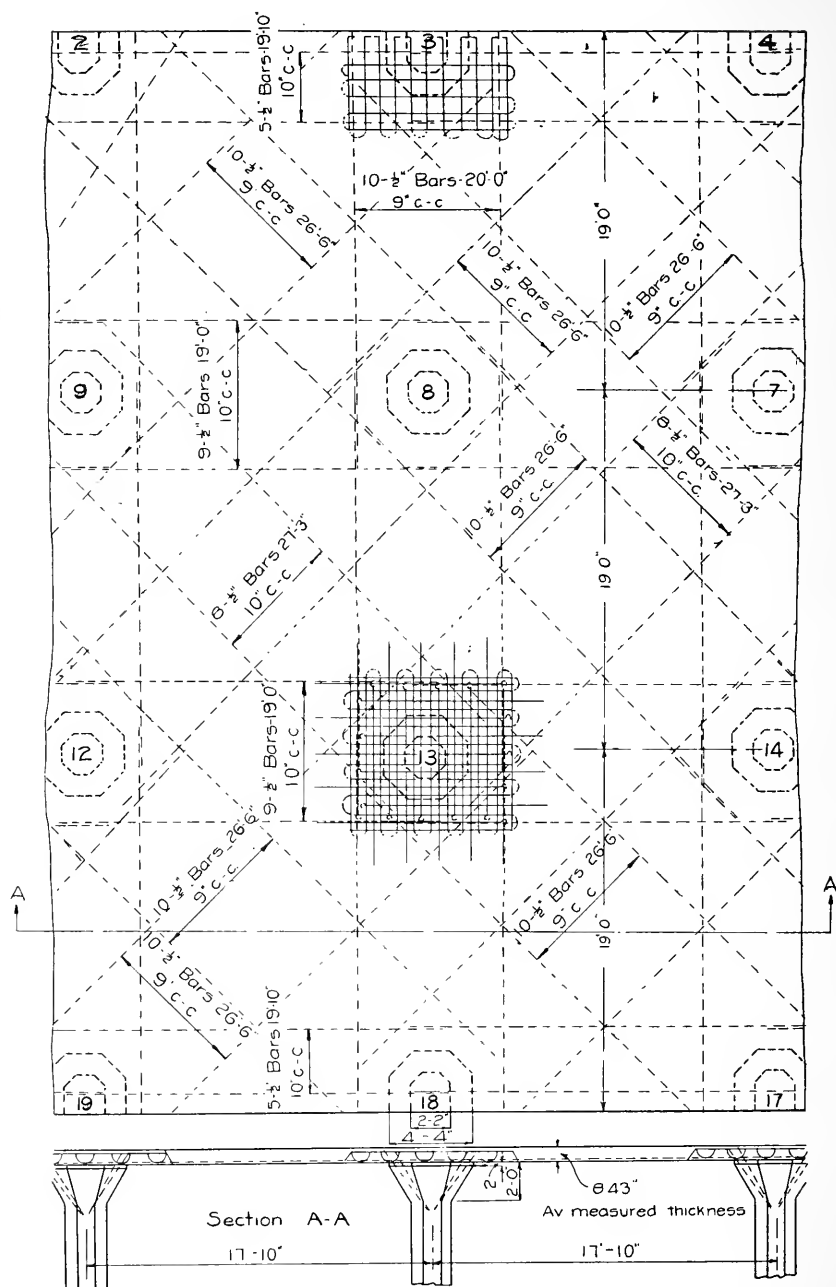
PLAN SHOWING DIMENSIONS AND REINFORCEMENT OF TEST FLOOR OF CURTIS-LEDGER COMPANY BUILDING.
